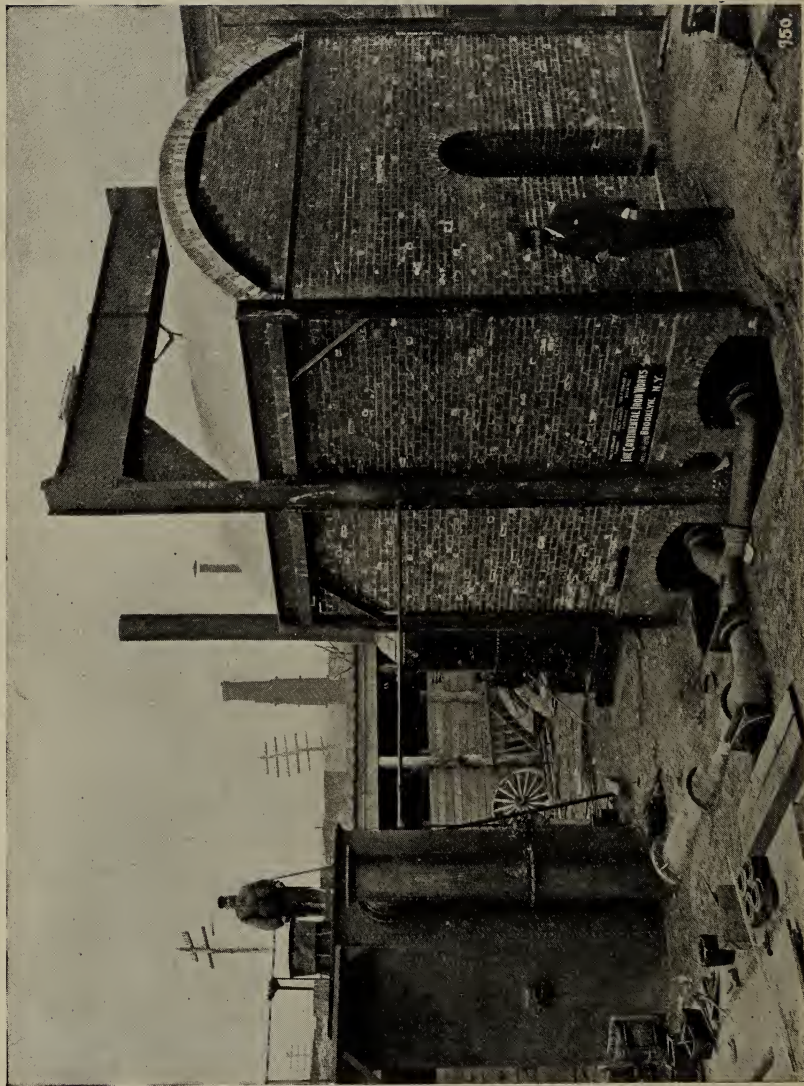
Plant erected to test fire-proofing structural metal in buildings.
